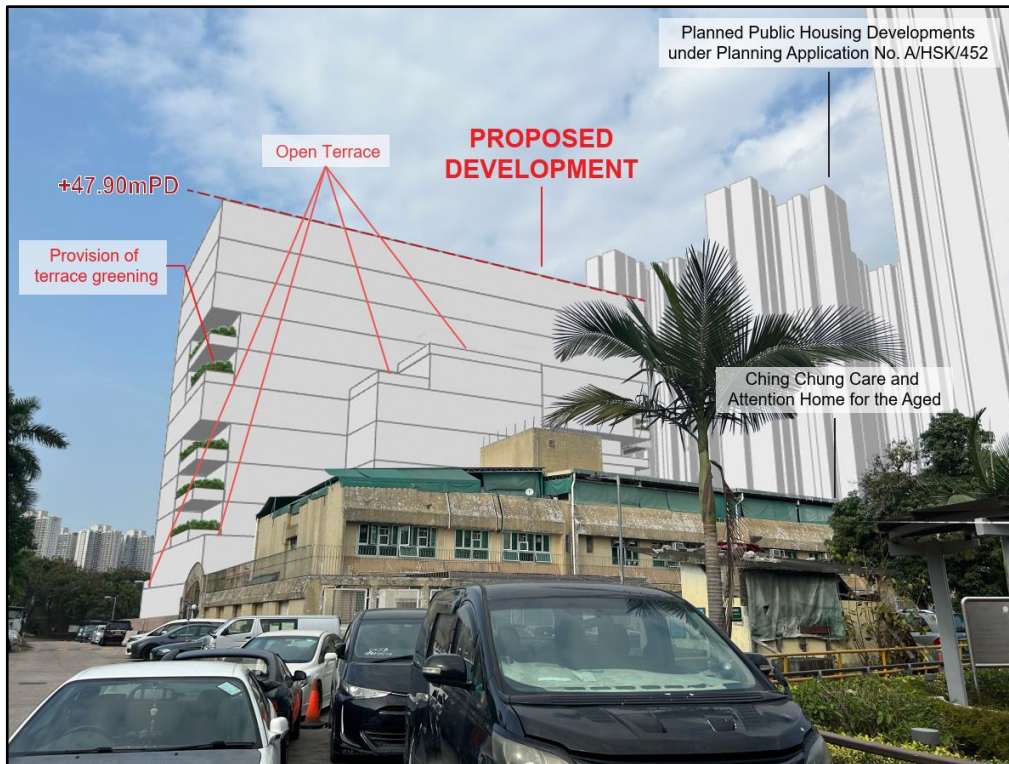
Proposed Stepped Terrace Design on 1/F, 2/F, 6/F and 7/F
